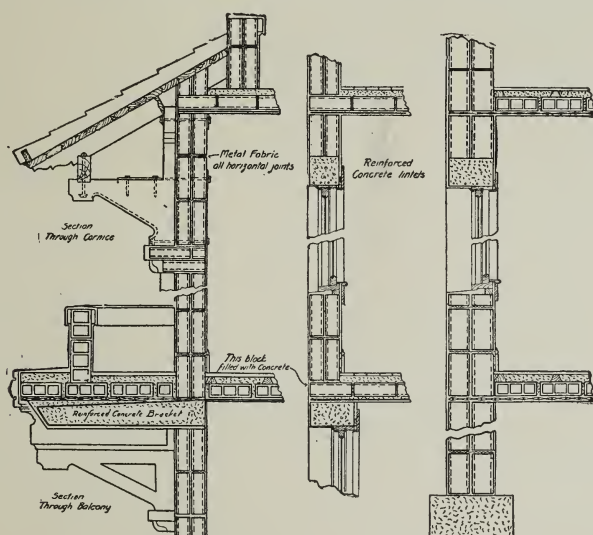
Terra-cotta Hollow Tiles for Outside Walls.
